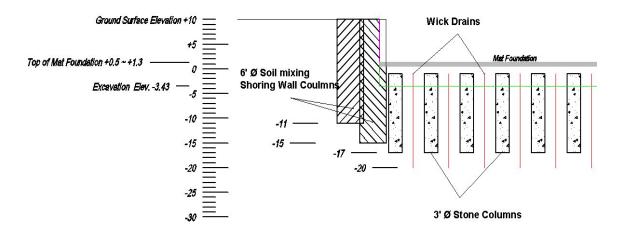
Elevation of the stone column and wick drain treatment at the Marina del Rey case history.
